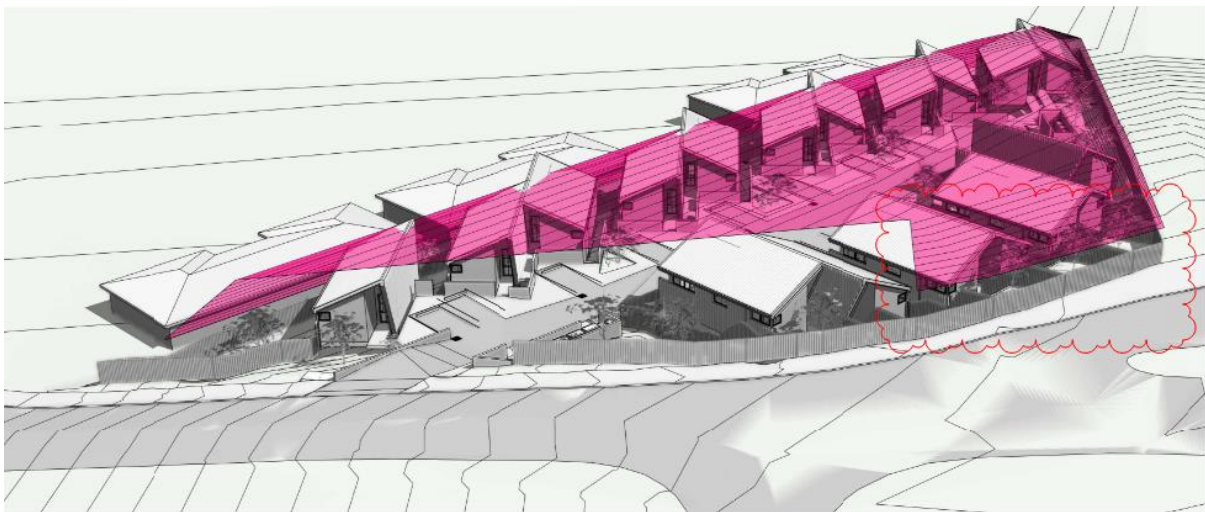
Shows the proposed dwelling units 1 to 11 on the north-western portion of the site as single storey when viewed from the internal driveway – image extract from 3D Perspective View – Heights, as prepared by Jaw's Architects, sheet no. DA-09
